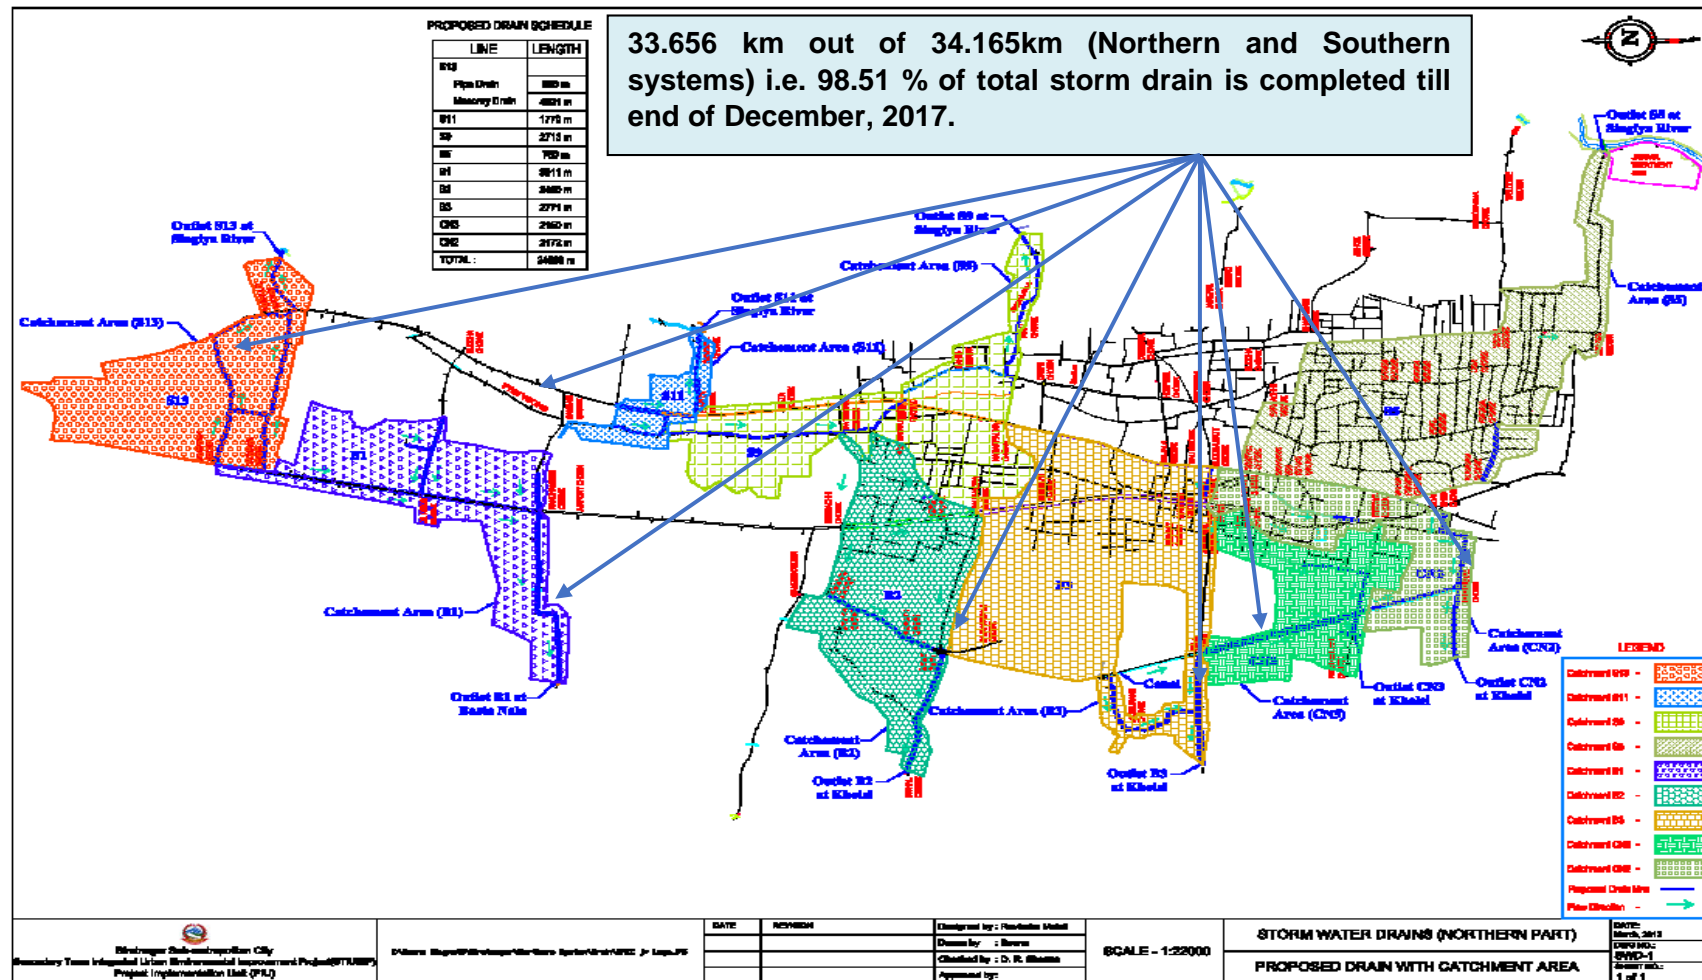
PROPOSED STORM WATER DRAINS IN BMC (Northern Drainage System)
